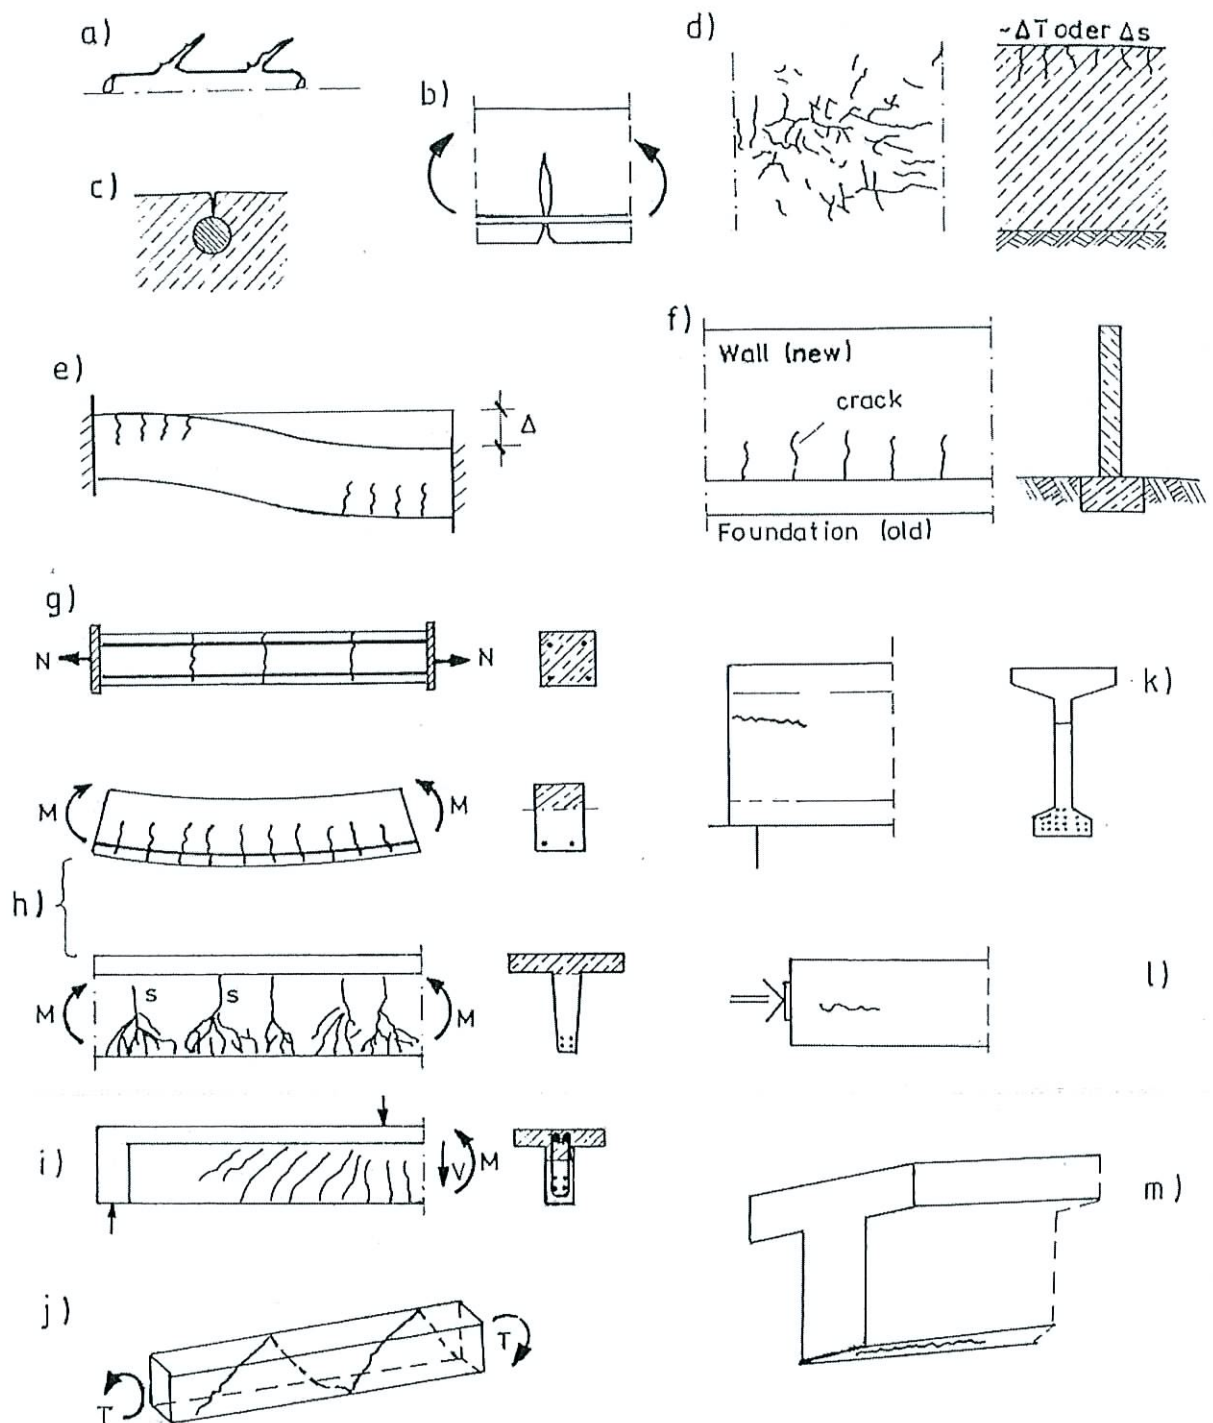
Types of cracks in concrete structures [extended from Leonhardt (1976a)]
